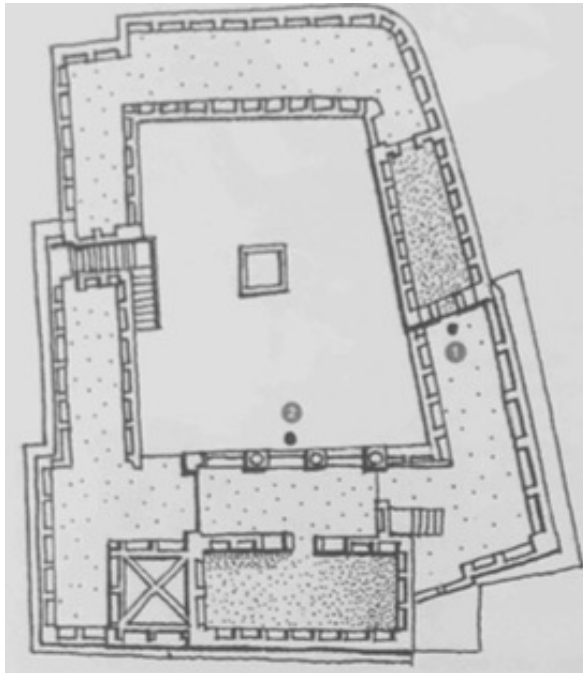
First floor Plan (Jaidah and Bourennane, 2010).
